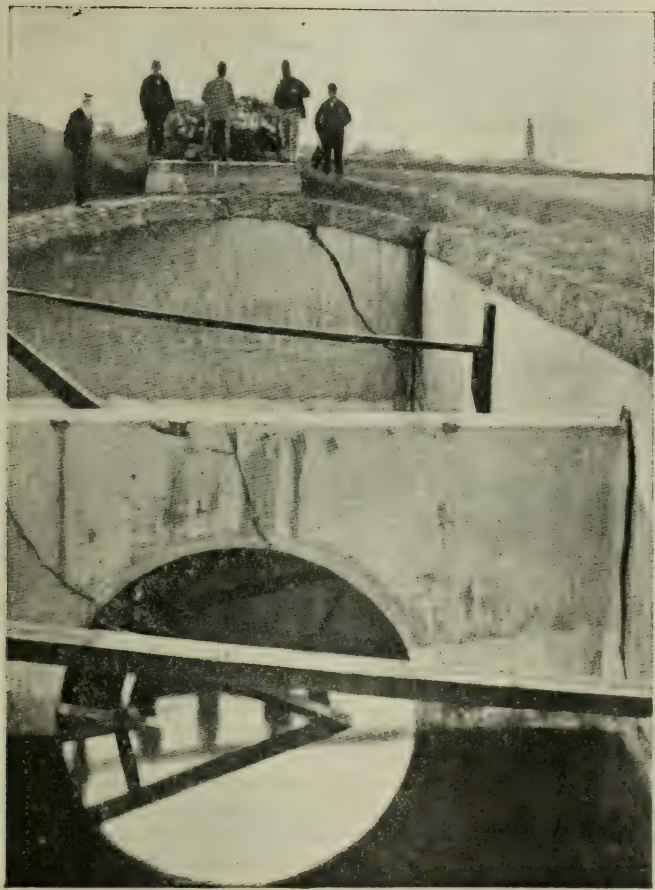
Concrete Reservoir Failure : West Bay, looking South.
